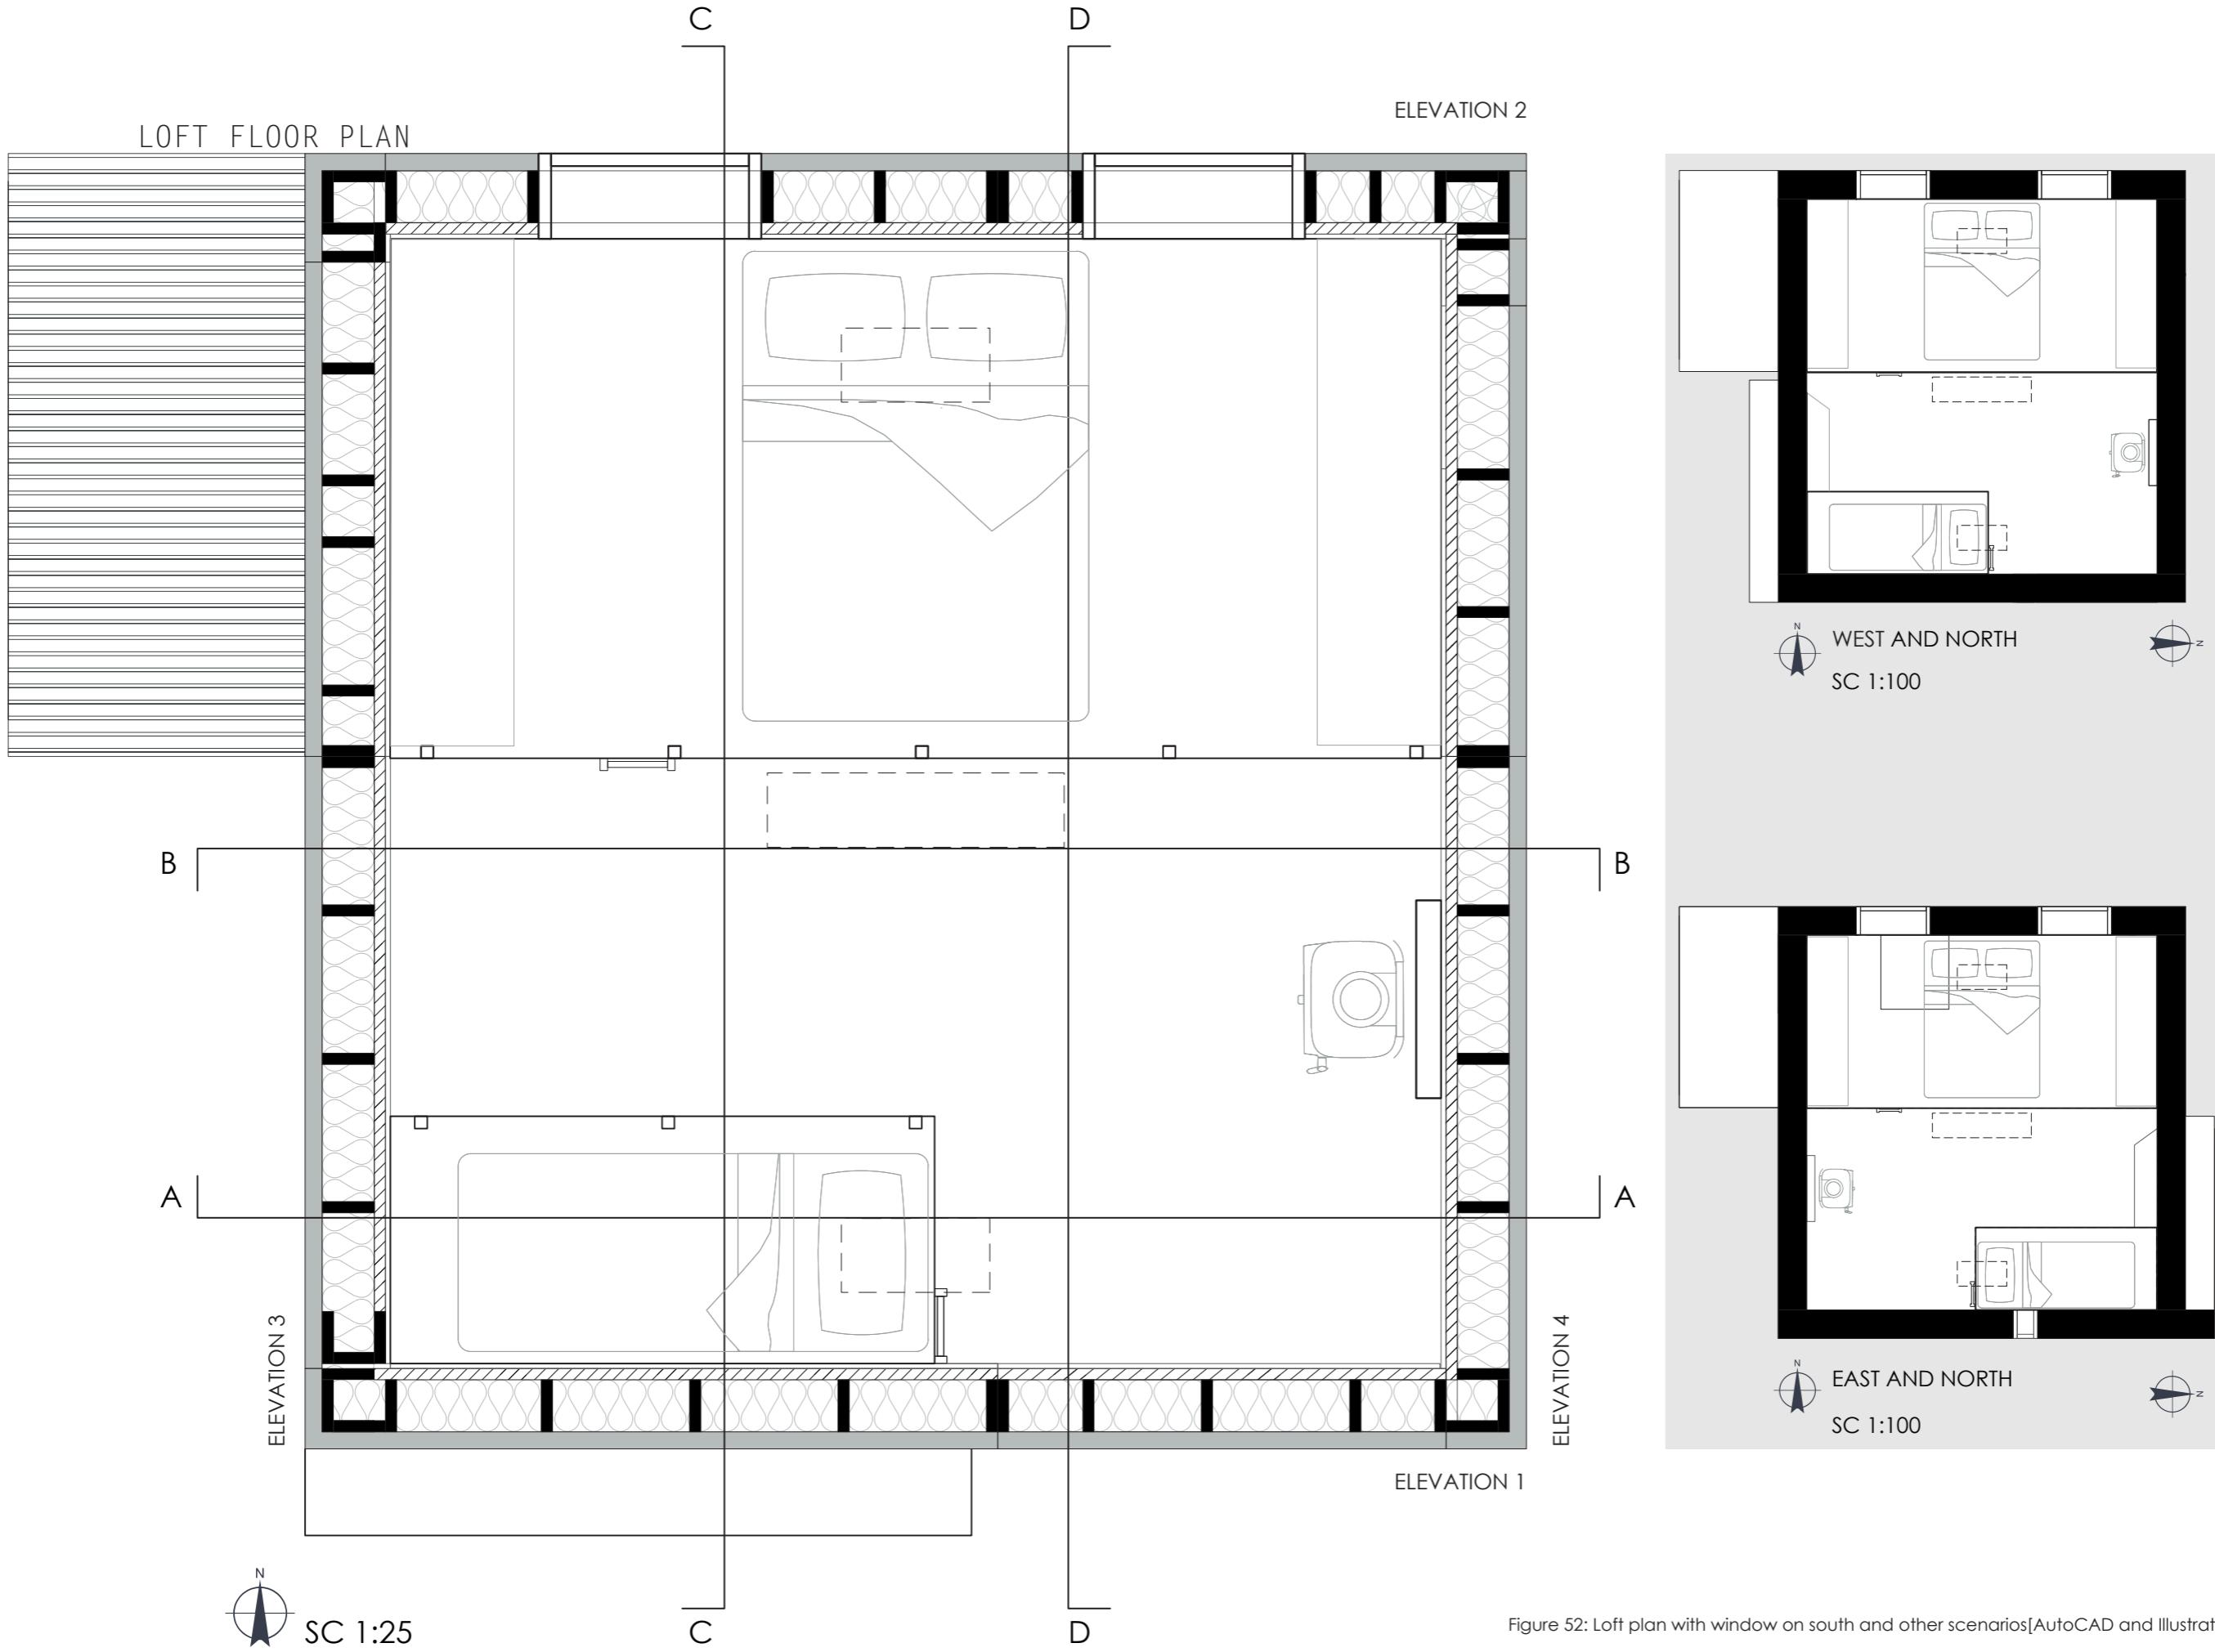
Loft plan with window on south and other scenarios[AutoCAD and Illustrator]
